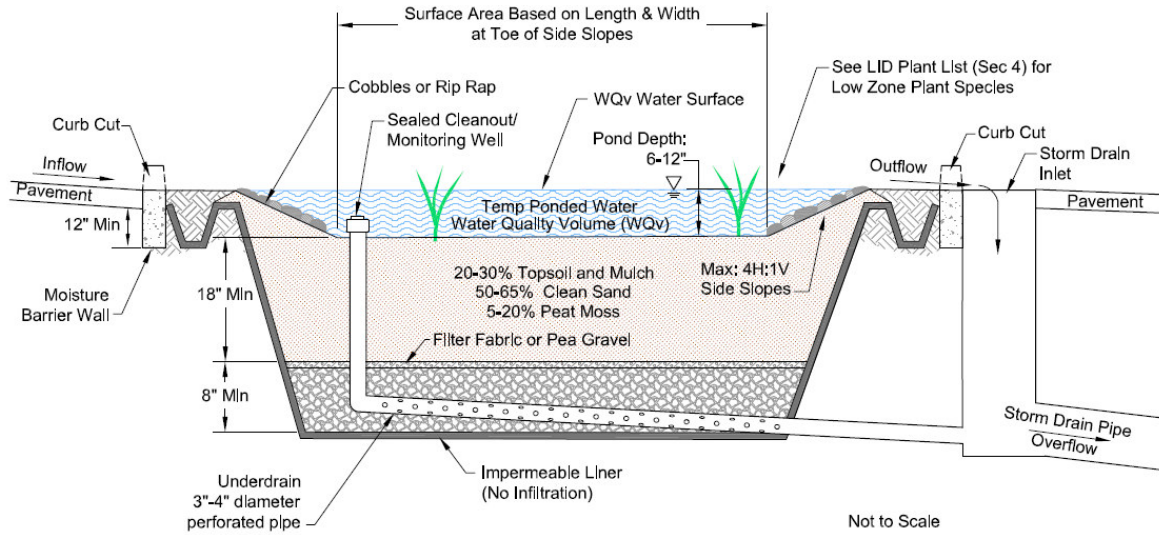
The detail of a bioretention basin sited on expansive soils with an impermeable liner, an underdrain system, and a storm drain inlet next to the basin.
